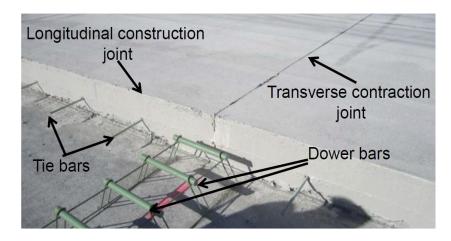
Dowel and Tie Bars in PCC Pavement (Khazanovich, 2011)
